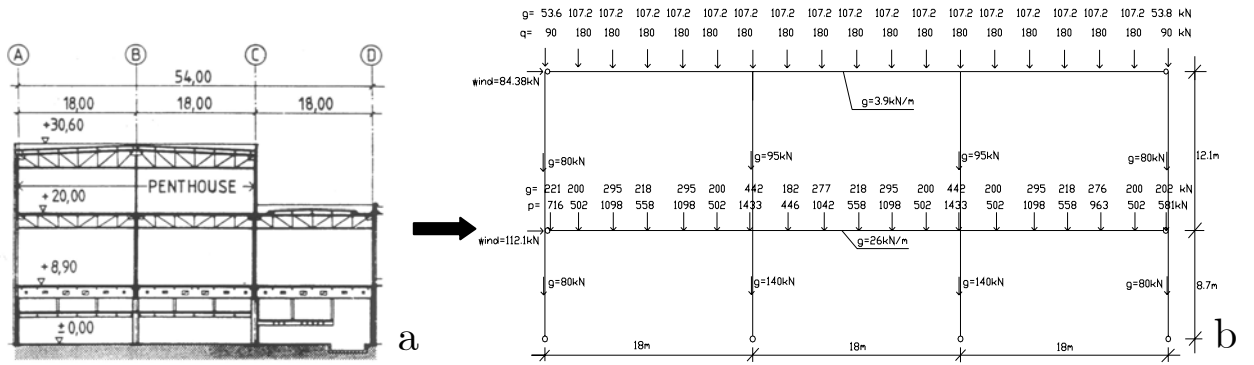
From the actual “Eisenach” structure to the substitute frame
